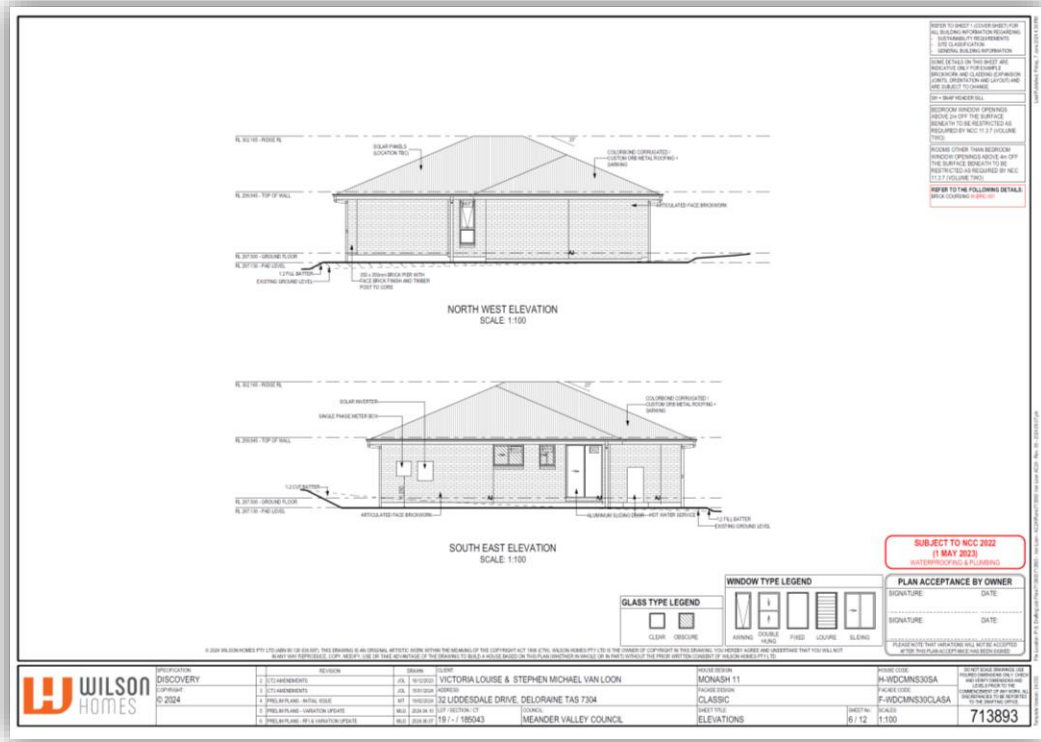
Elevations of proposed dwelling (provided by Wilson Homes).
